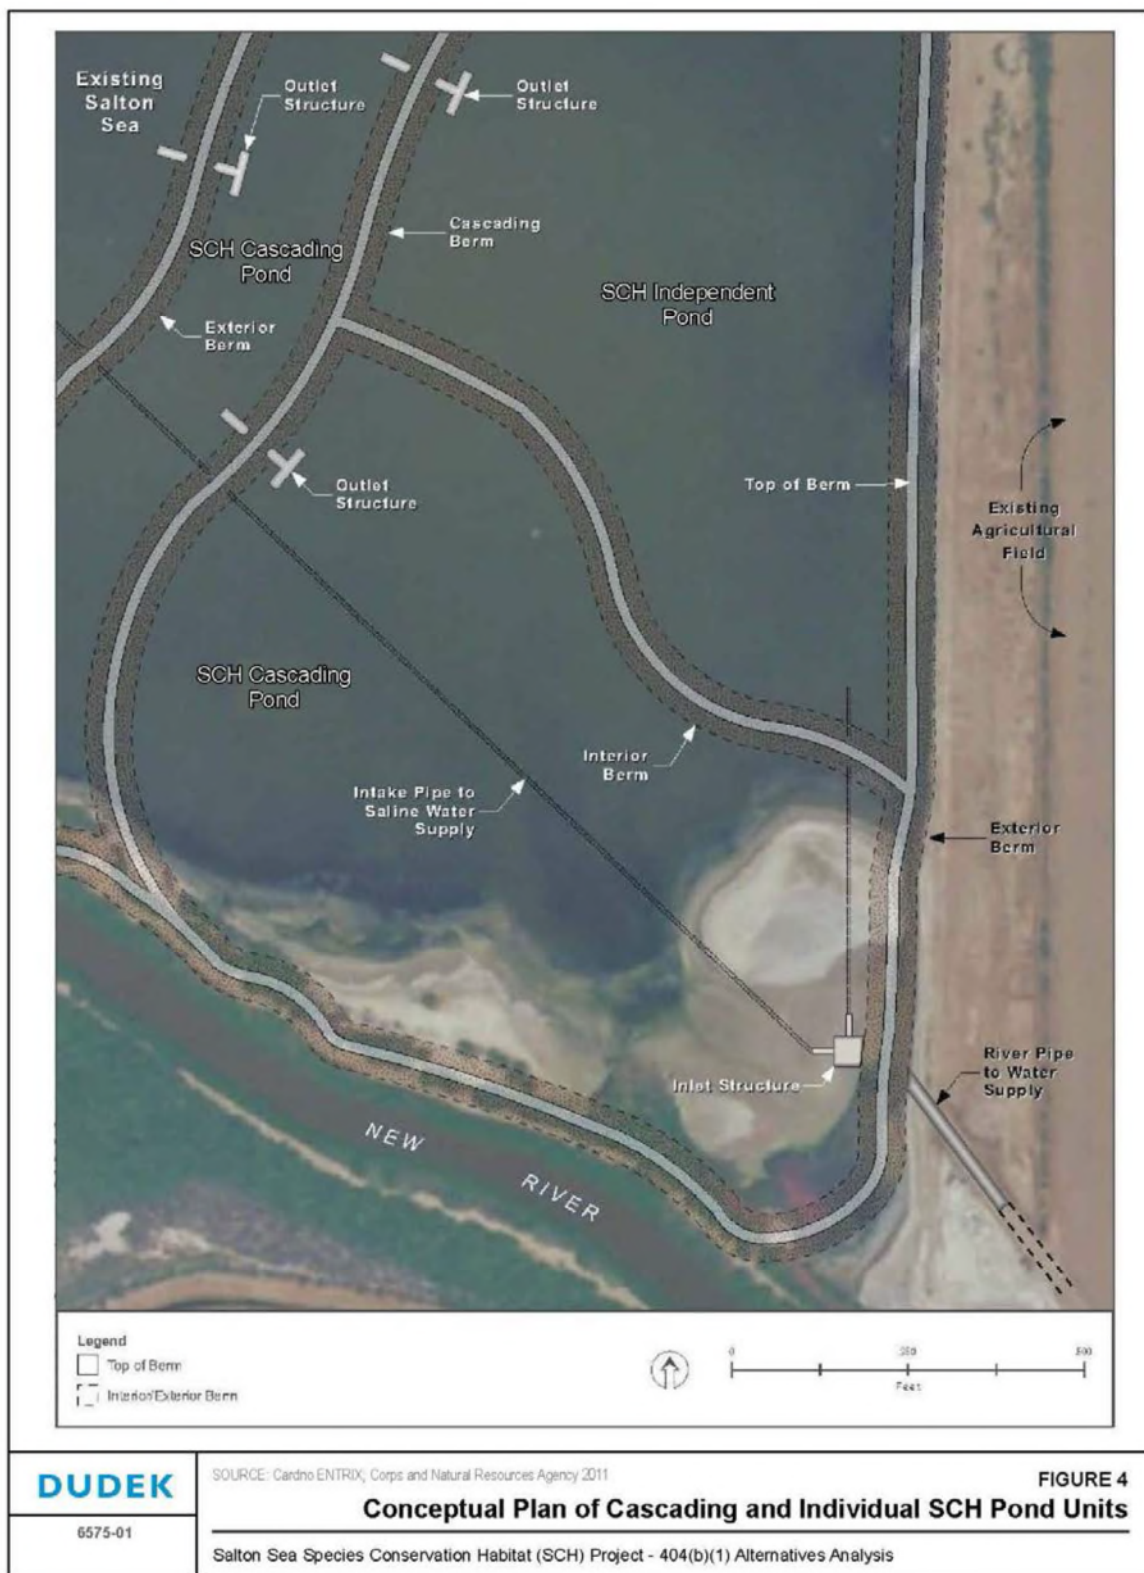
Conceptual Plan of Cascading and Individual SCH Pond Units
